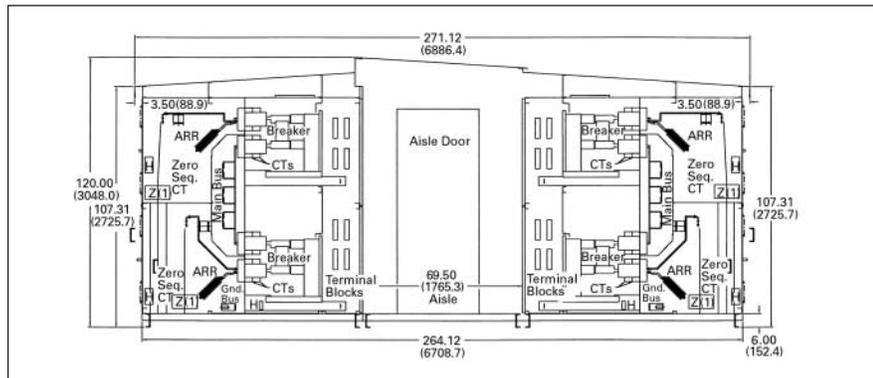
Outdoor Sheltered Aisle Double Row
